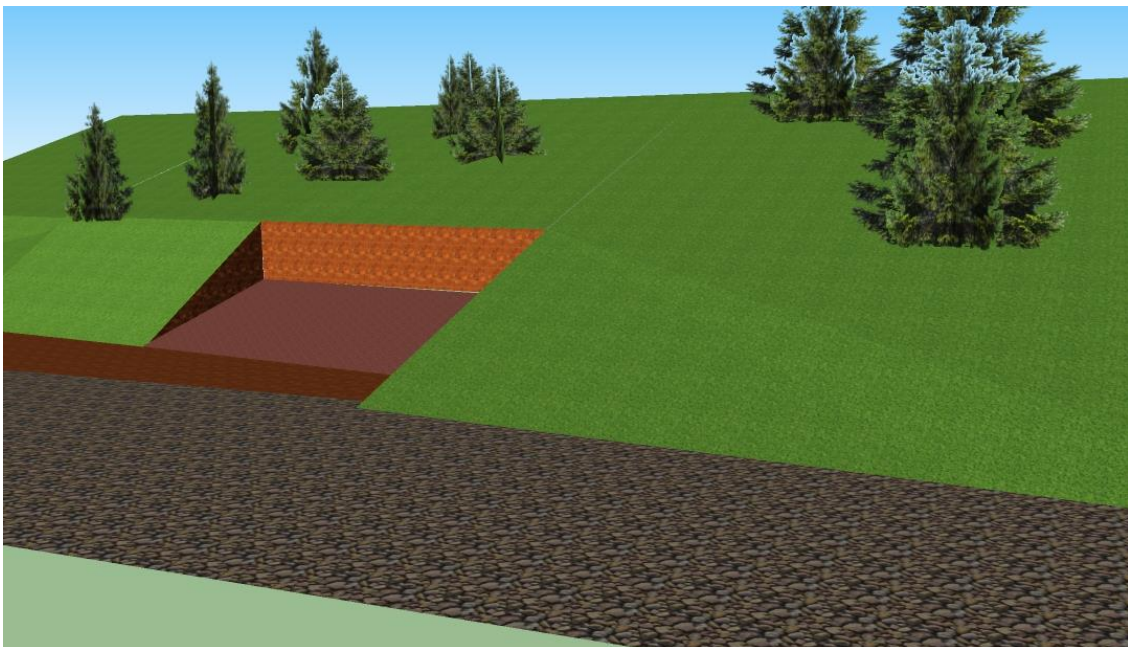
Depiction of east trench, true to scale, parallel to the road and cut into the hillside.
